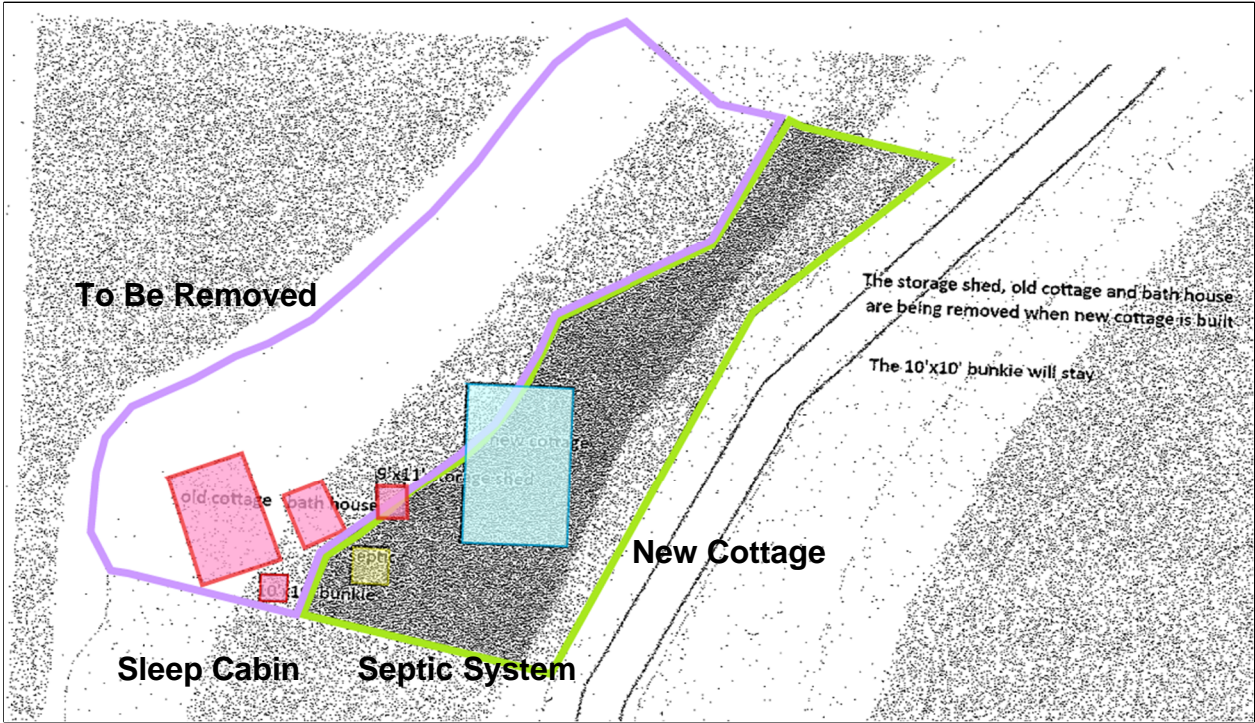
Applicant submitted plot plan showing the existing (red) and proposed structures (blue), septic system (yellow), along with the current property boundary (green outline) and Shore Road Allowance (purple outline).
